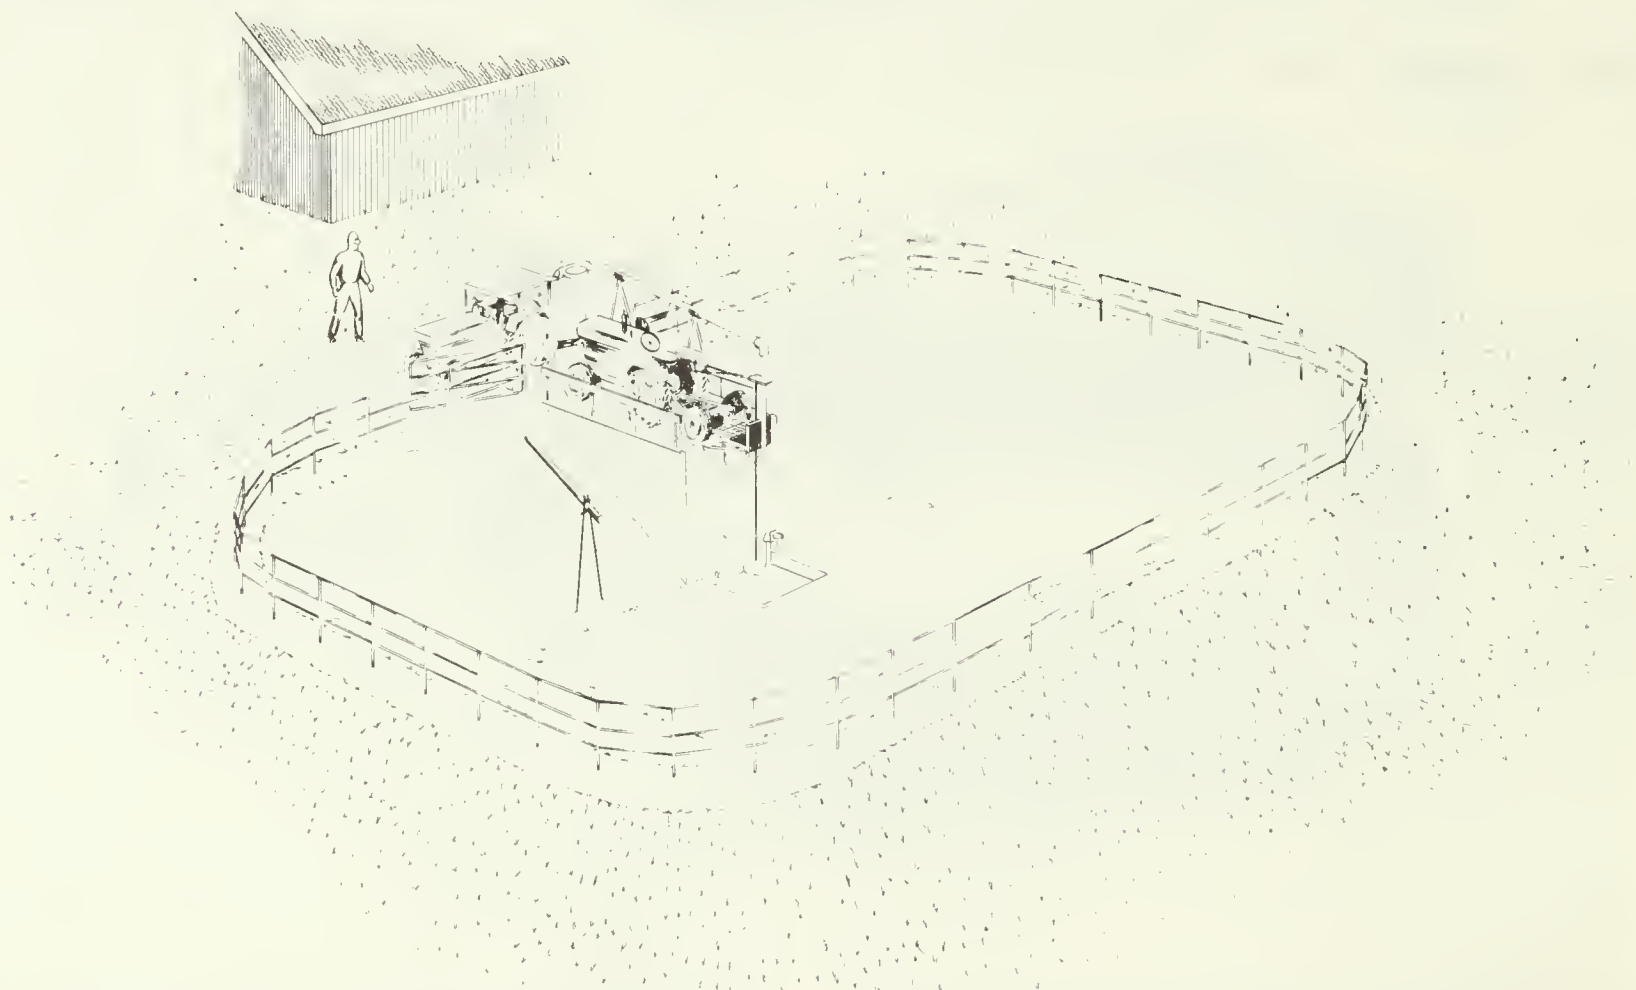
Clay-lined manure storage pond with pumping dock (CPS plan M-2702)
